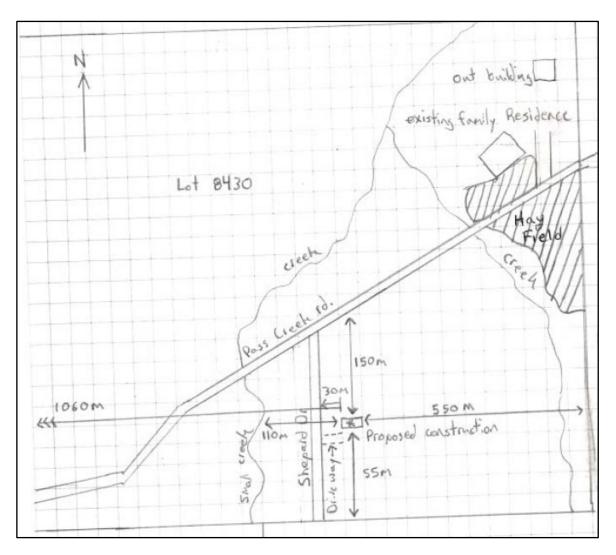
Site Plan showing the proposed Accessory Dwelling location
